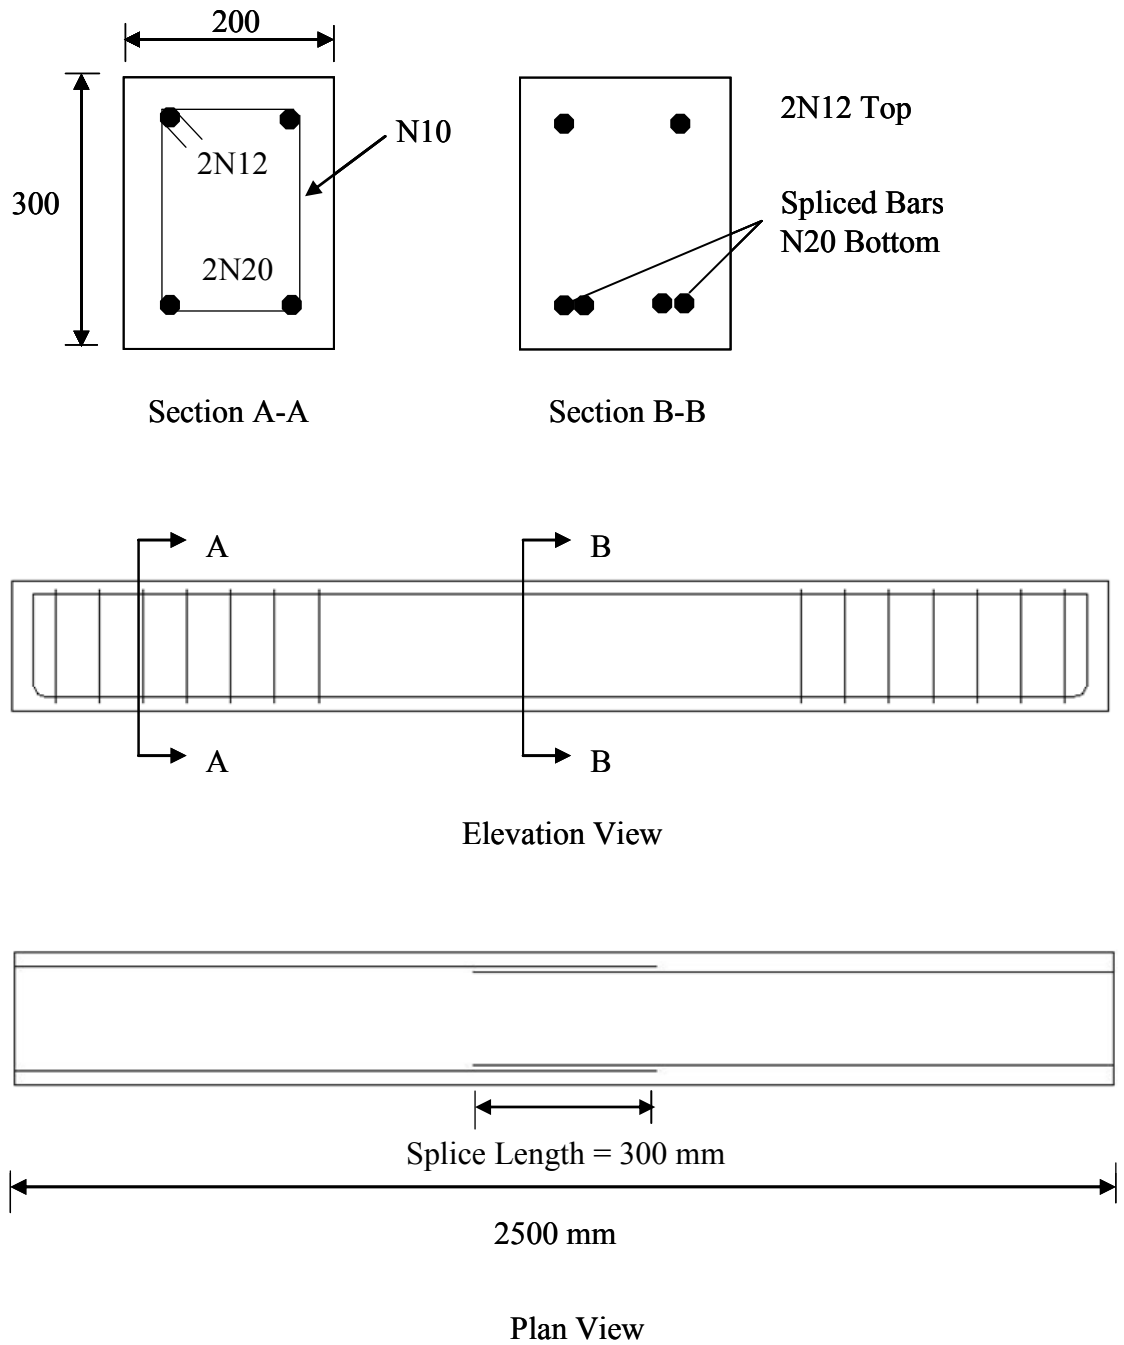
Geometry and Reinforcement Arrangement for Beams N-D-1.5 and H-D-1.5
